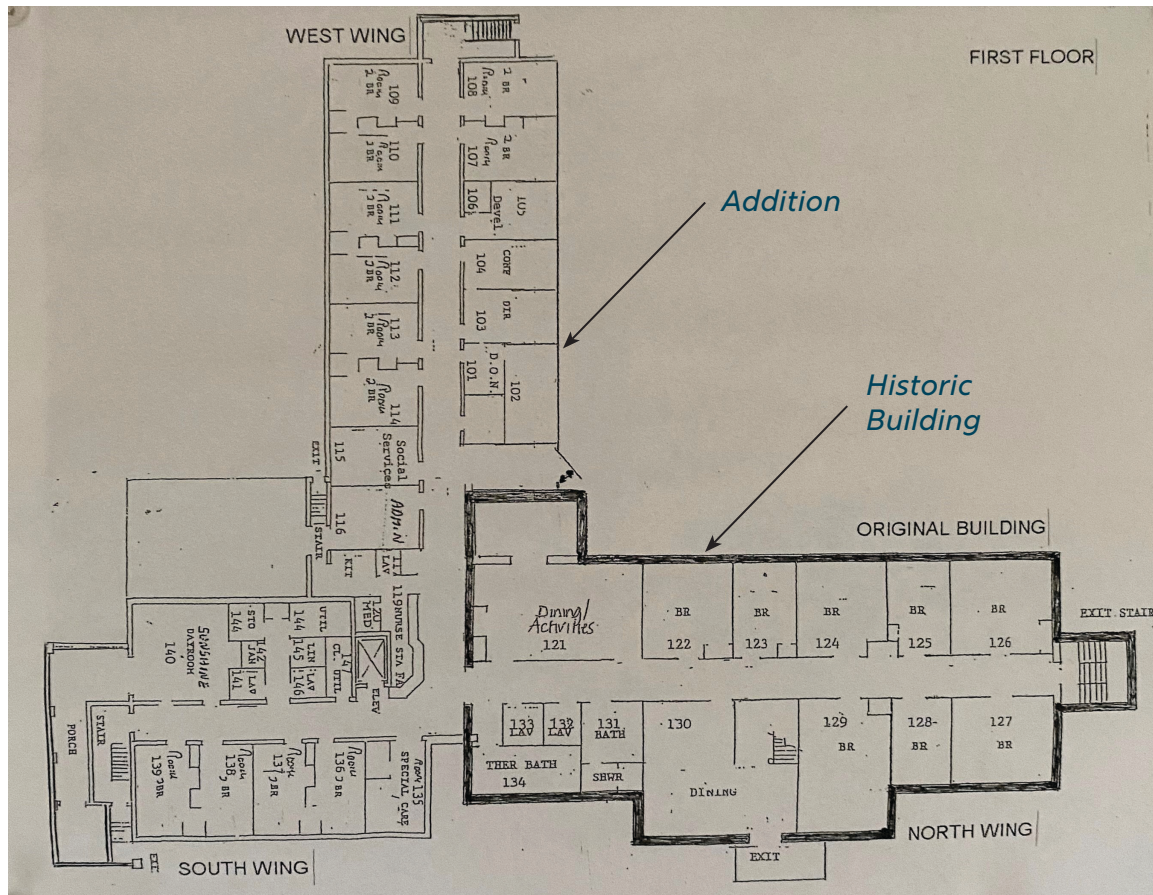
The historic structure, which has about 16,000 sf of floor area, was built in 1876 and renovated in 1989. The addition was built in 1989, adding another 20,000 sf. Most of the floor area is on the first and second levels, although both buildings have a partial basement level as well.
